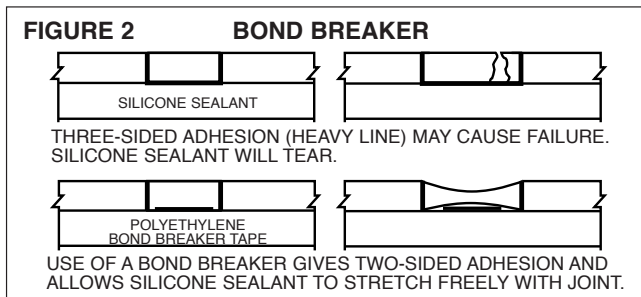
illustrates why silicone sealants need bond breaker tape to prevent undesirable three-sided adhesion.
